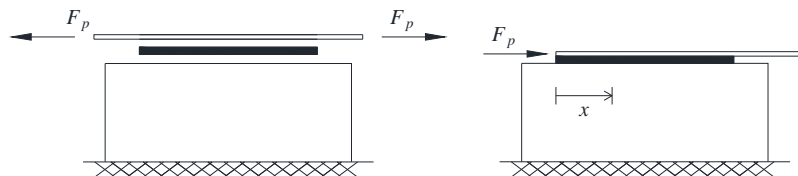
Stages of the gradient anchorage: (a) Prestressing and anchoring of the strip; (b) Release of the prestress force on one side of the concrete block.
